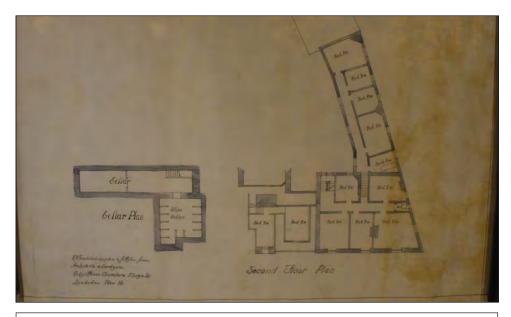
1919 Architects Plan of Deganwy Castle Hotel Prior to the Remodelling of That Year (Source: Conwy Archives C Maps & Plans 22/3)
